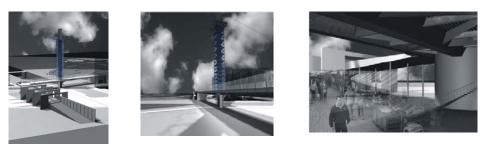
View of the bridge Fig. 40 View of the bridge Fig. 41 View under the bridge
